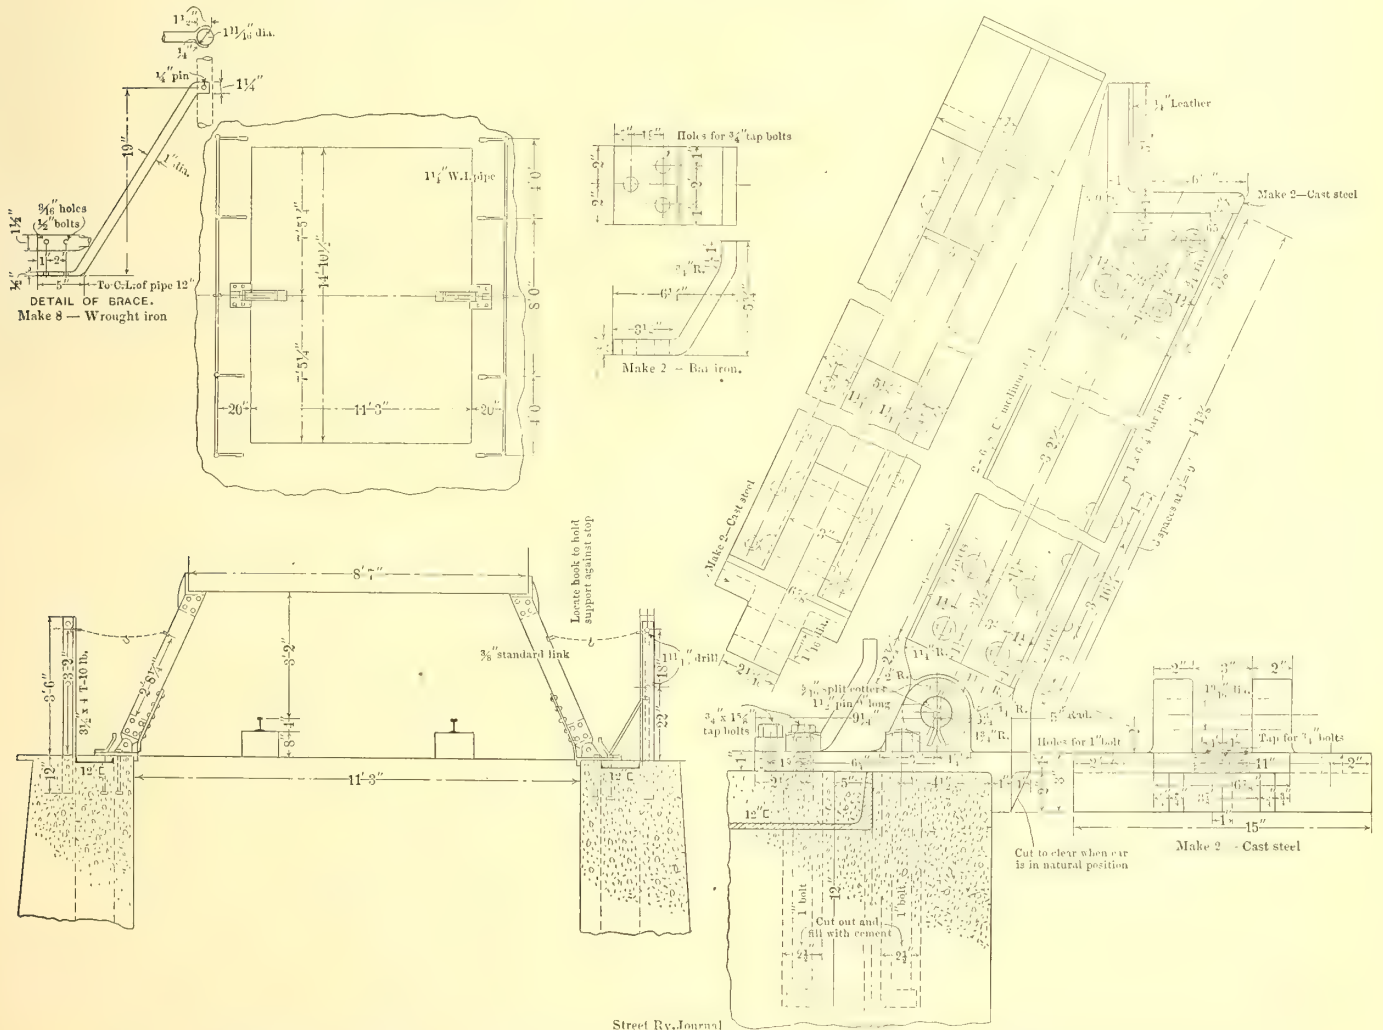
CONSTRUCTION DETAILS OF THE STEEL CAR SUPPORTS USED AT THE THIRTY-SIXTH STREET SHOP
